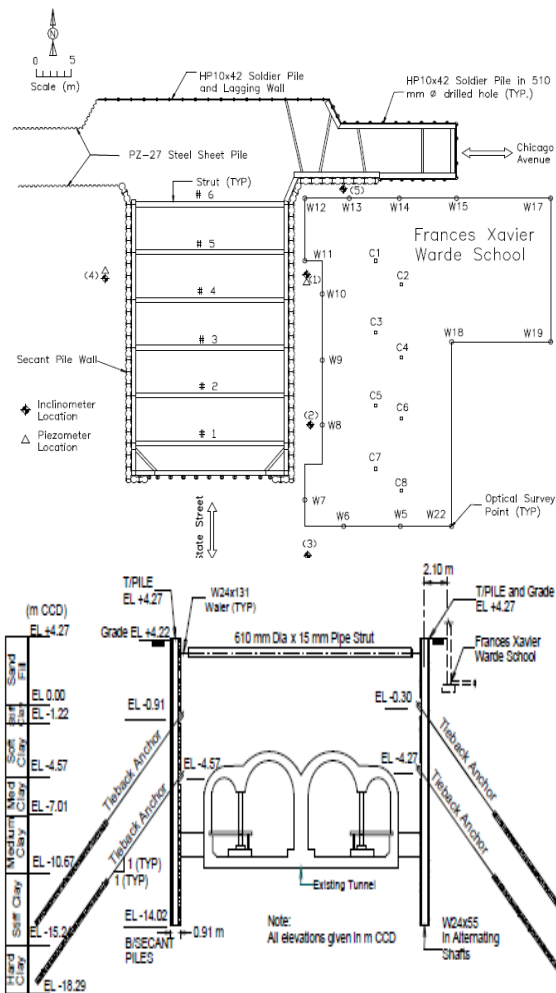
Plan and section View of Excavation Site (After Bryson, 2002)
